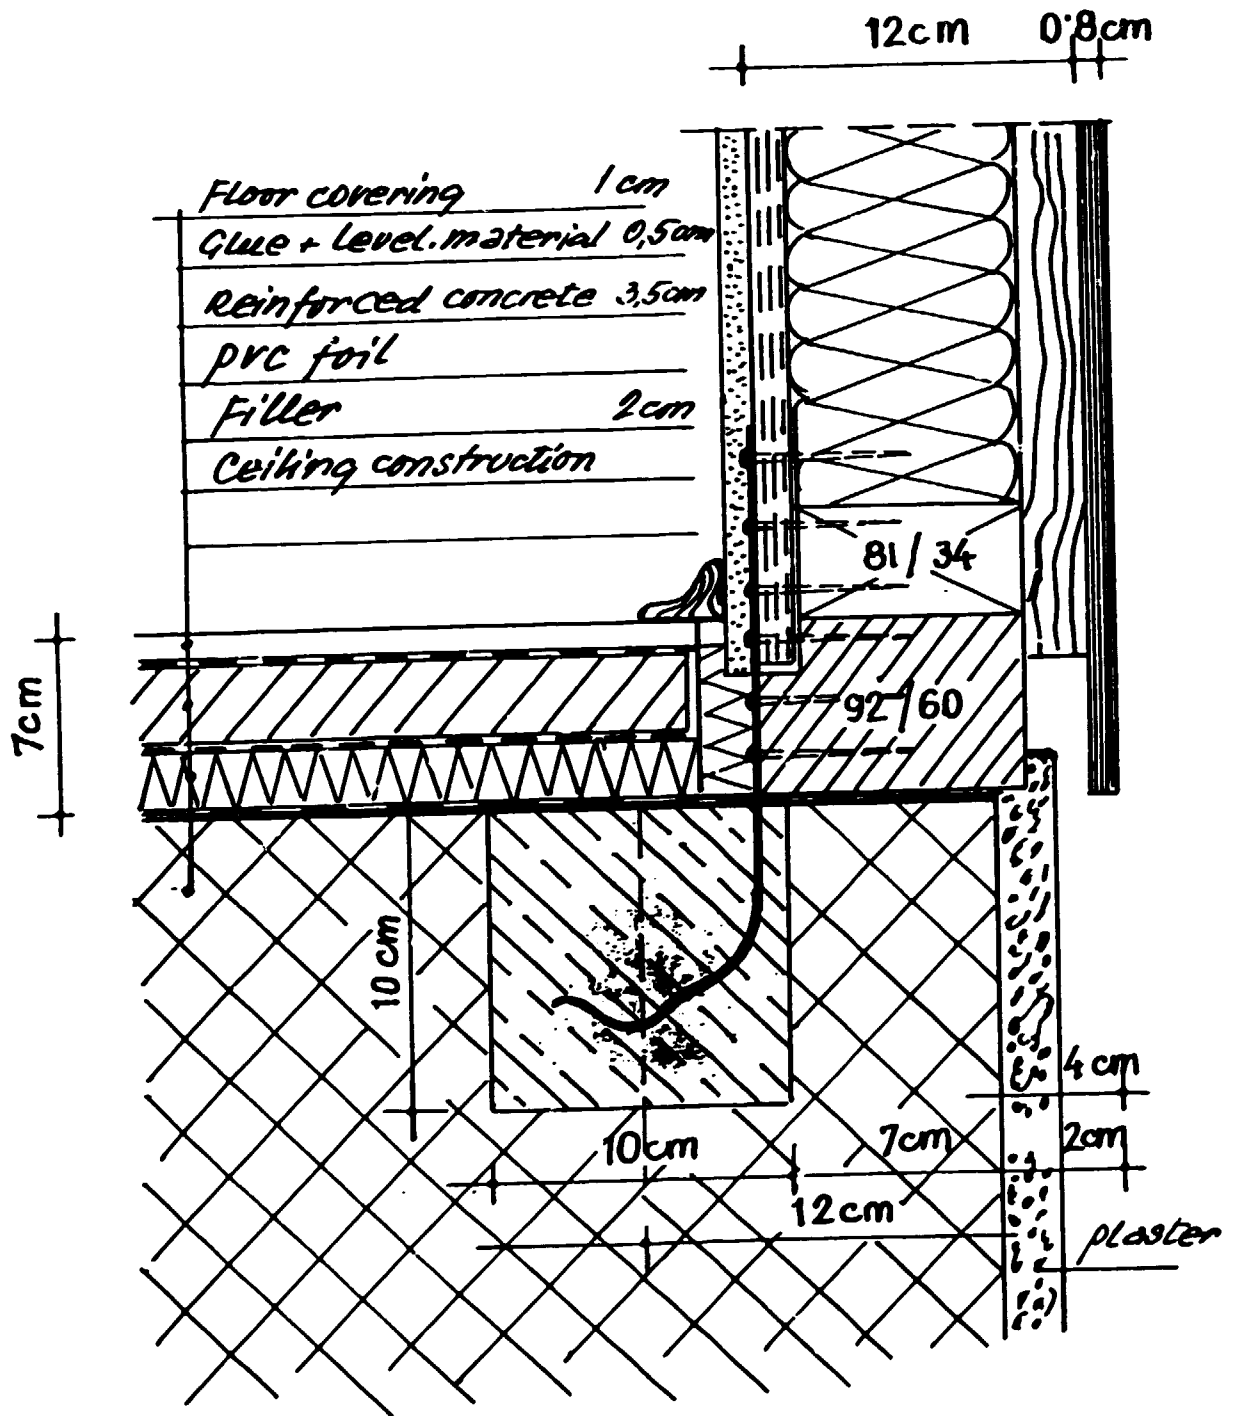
Anchorage system for a wall on a cellar concrete slab.
